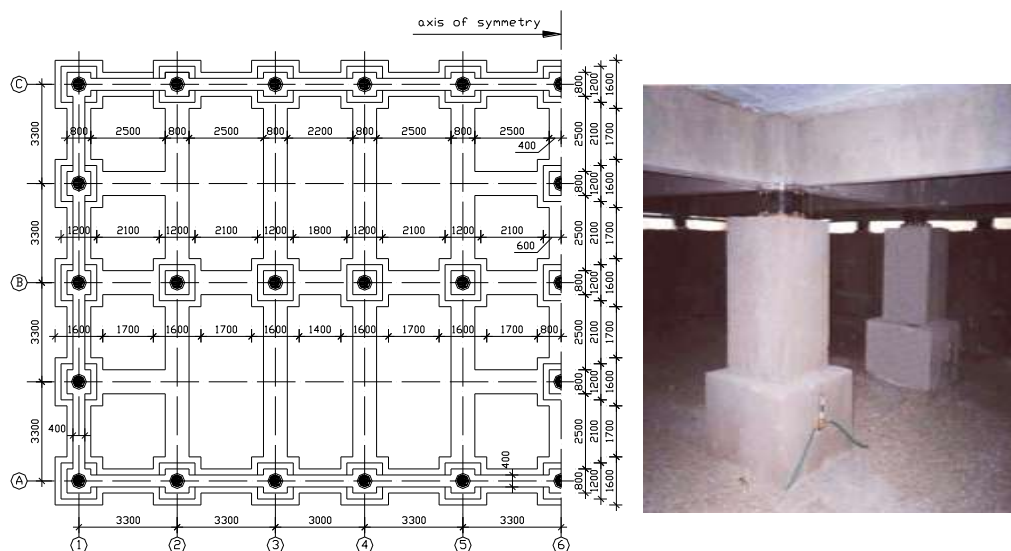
The foundation plan of the multi-apartment building with the location of seismic isolators and view of the fragment of seismic isolation system in this building
